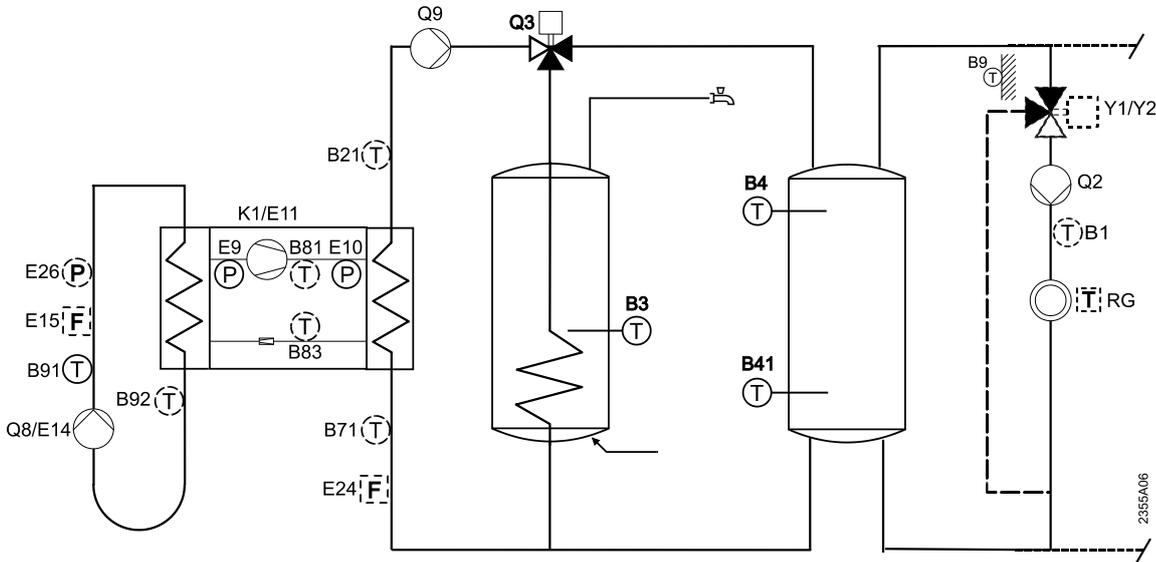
DHW storage tank and space heating with the buffer storage tank.
